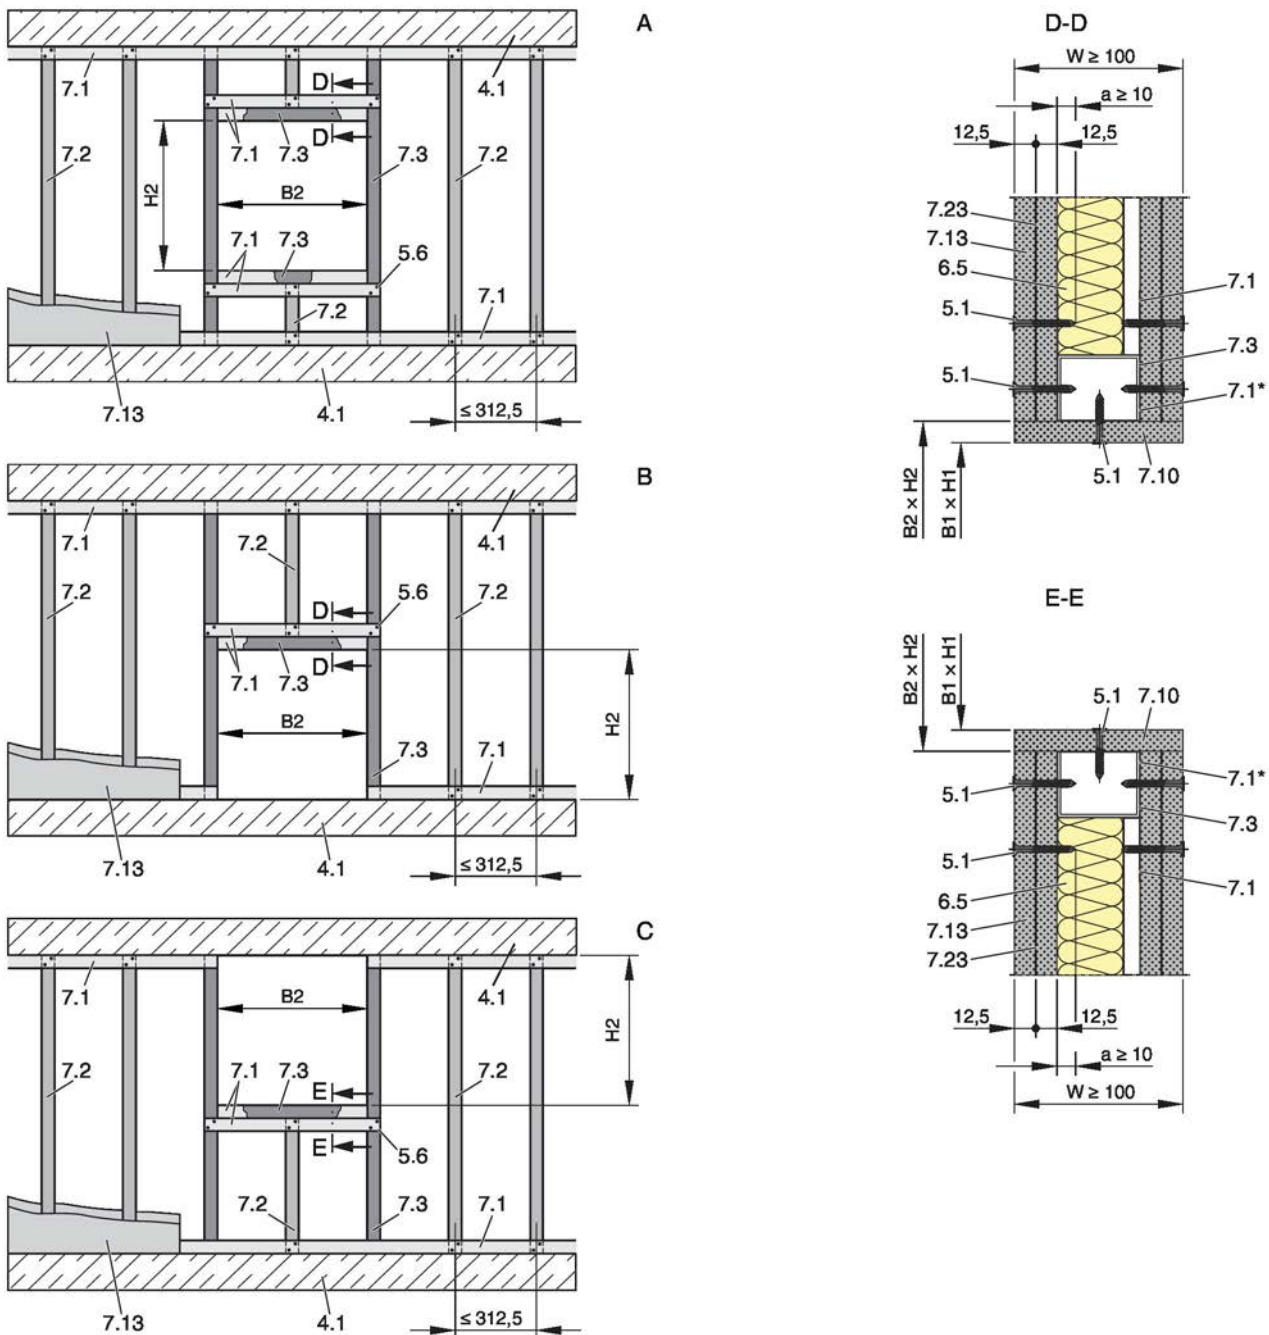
Compartment wall with metal support structure and cladding on both sides
